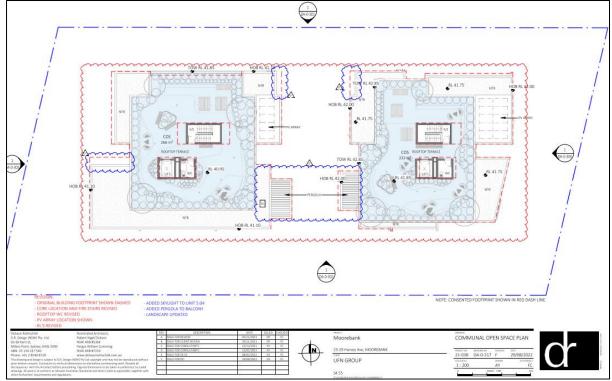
Communal Open Space Plan - Revision F - S4.55
